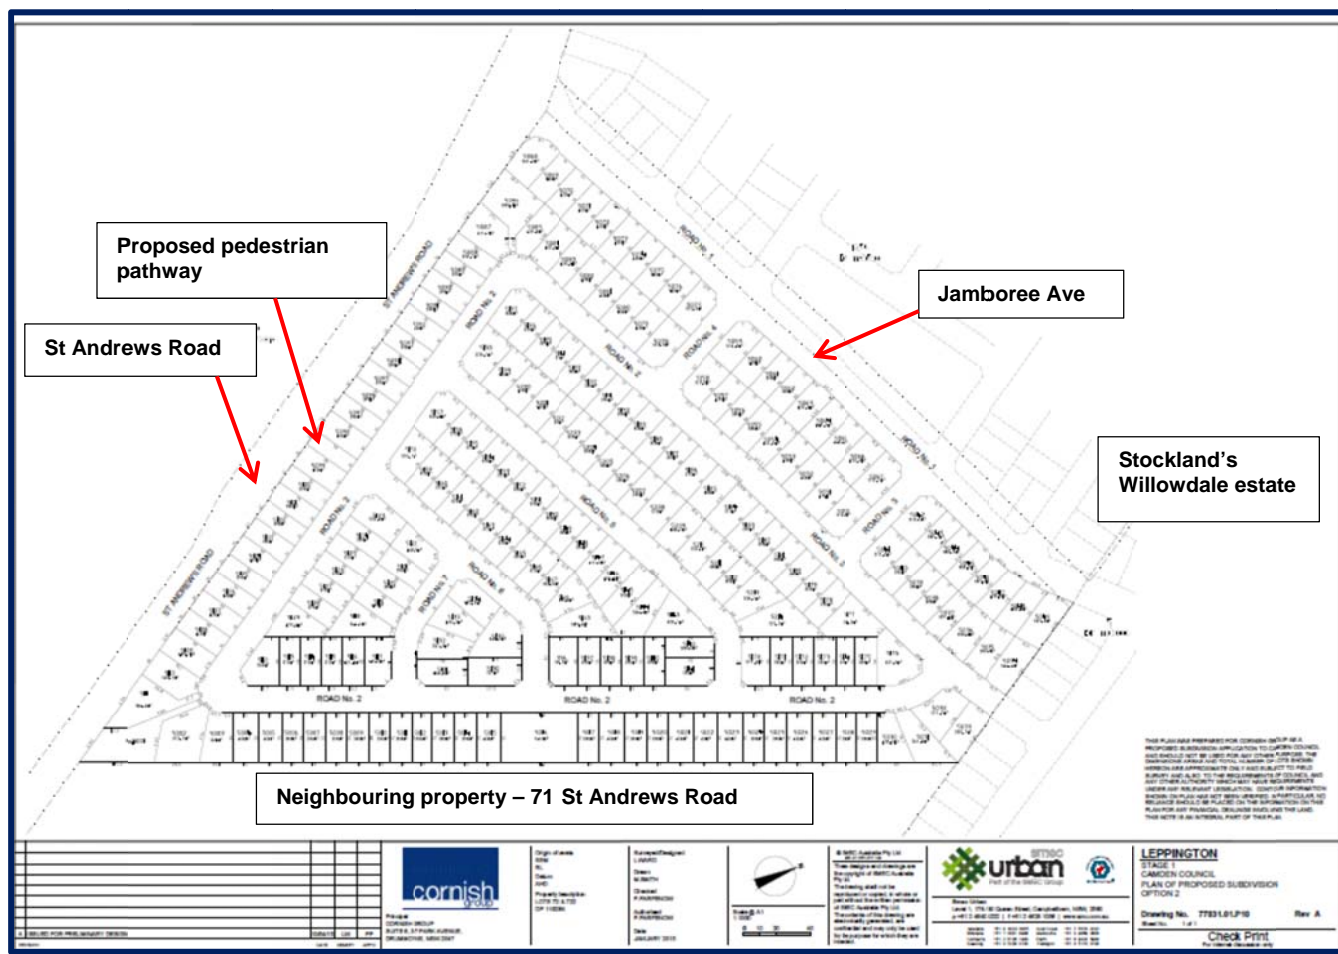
Proposed Subdivision Layout Plan (refer to Attachment 2)
